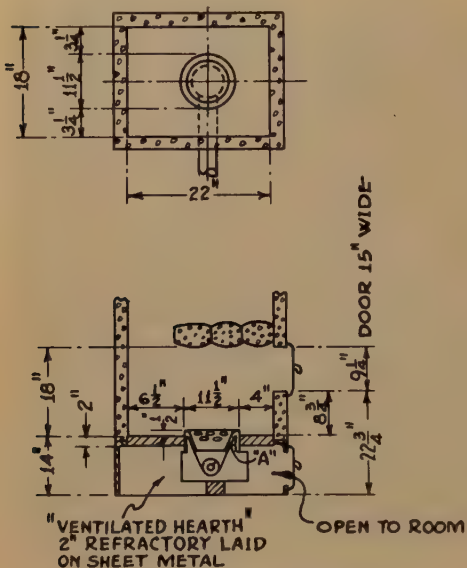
INSTALLATION OF STOKER NO. 1 IN STEAM BOILER.
